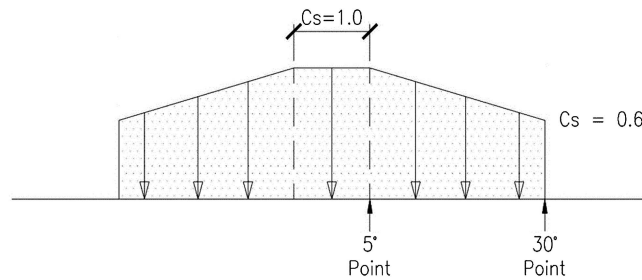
Sloped roof snow load for air-supported structures.
